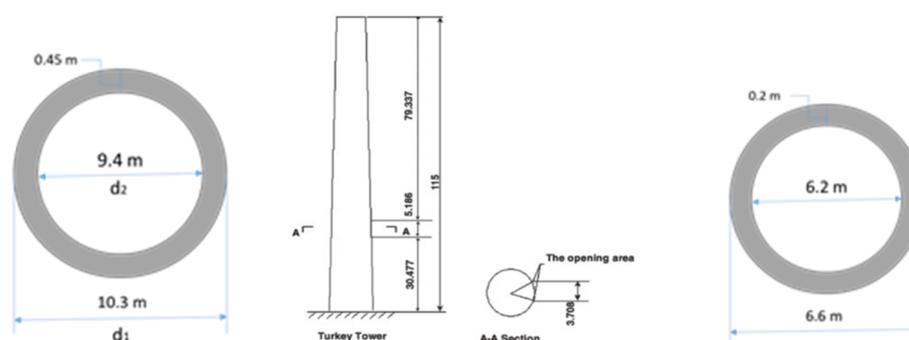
The section views at the lowest and highest level of the structure and the elevation view.
